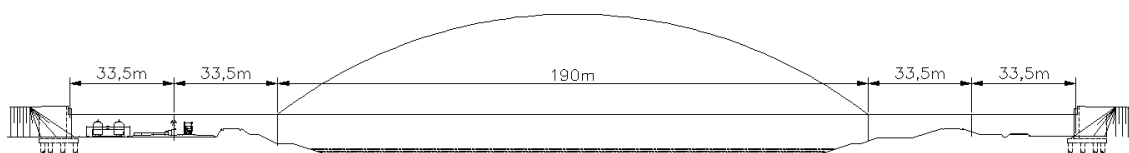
1st Solution. Bowstring Bridge with 190 meters span.
